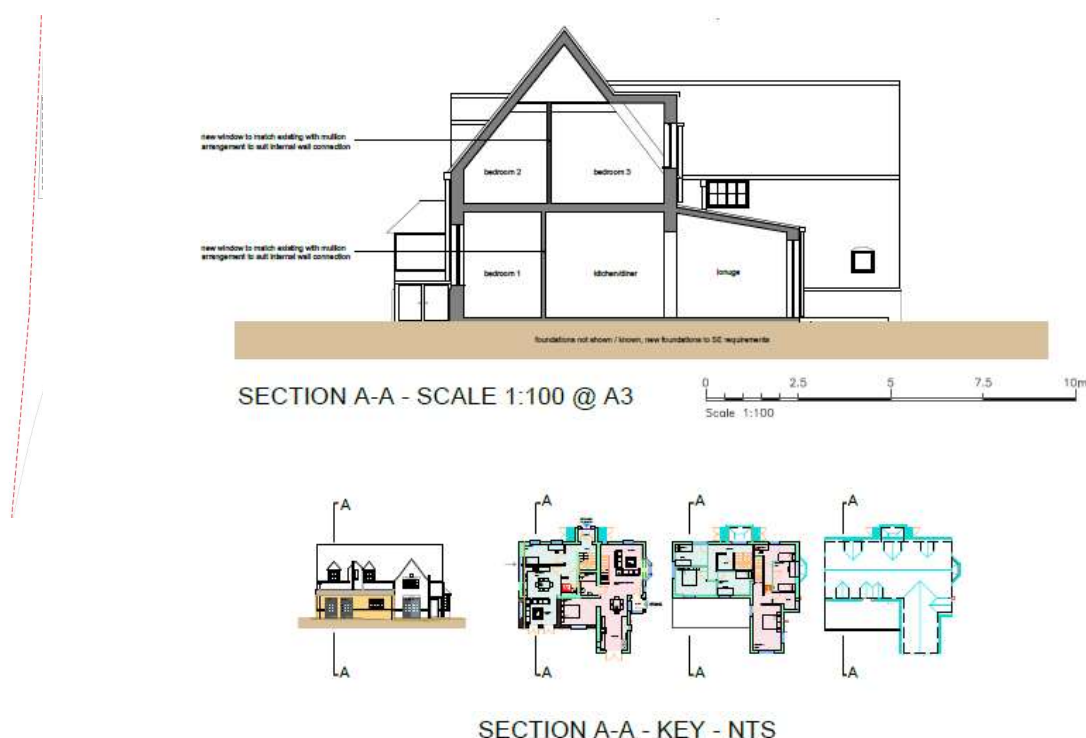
Proposed Elevations (please note – larger version of plan can be found in the Committee Plan Pack)
